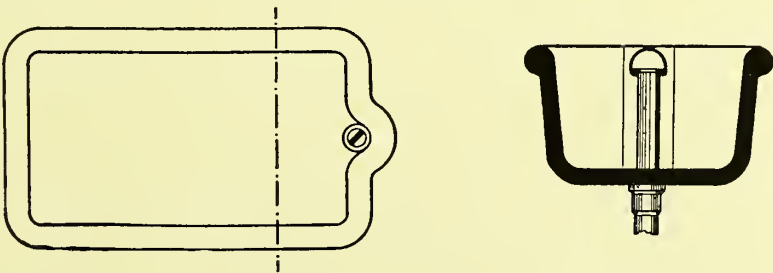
Deep Fireclay Sink with Roll Edge and Recessed Outlet
